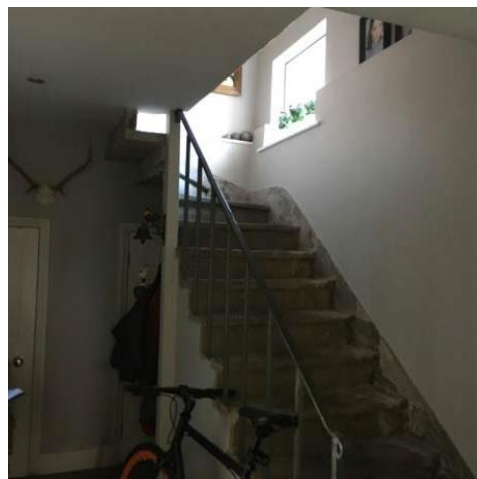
Existing stair spindles with spacing greater than 100mm apart.
